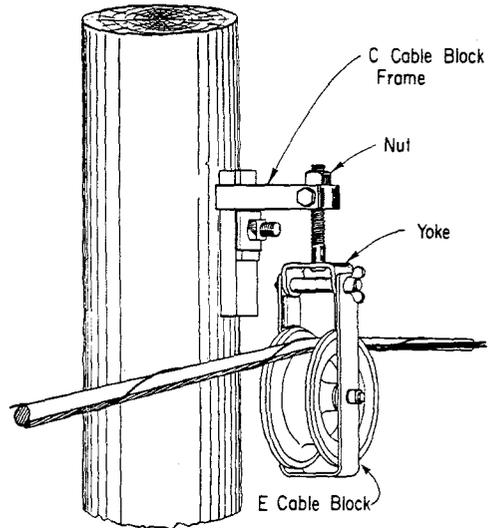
C Cable Block Frame (With E Cable Block Installed)
